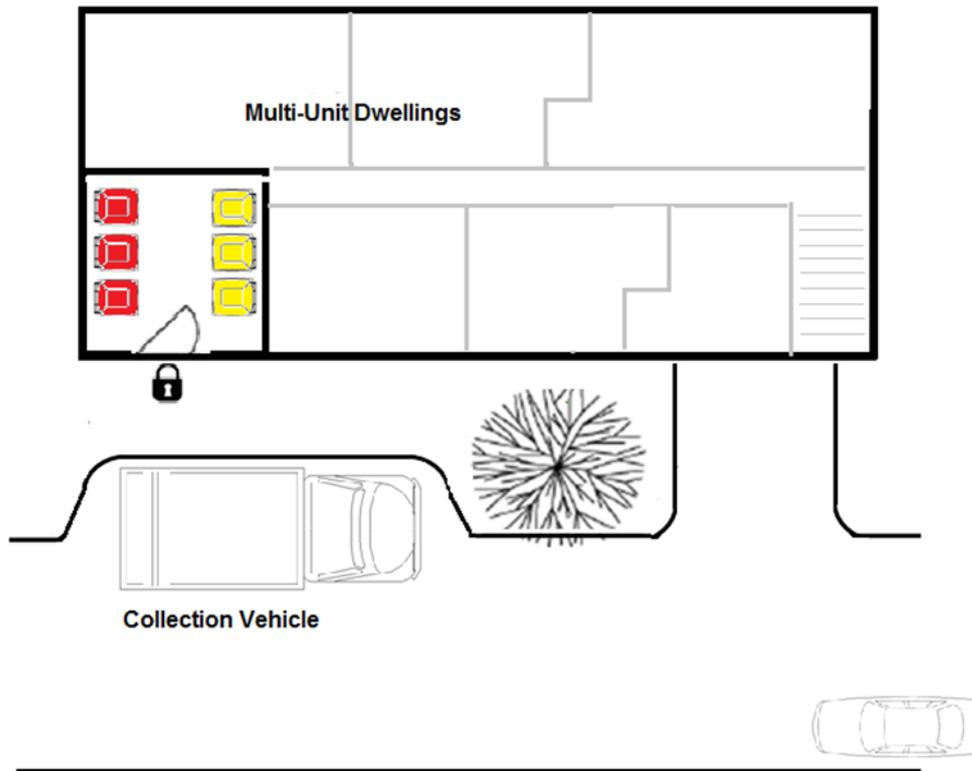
Use of off street ground floor level storage area for collection (with lay-by)
